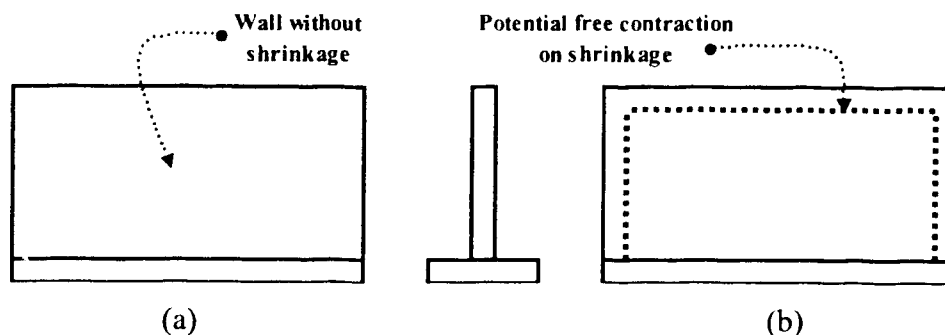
Continuous edge restraint of wall cast on a base, (a) wall without shrinkage, (b) potential free contraction
